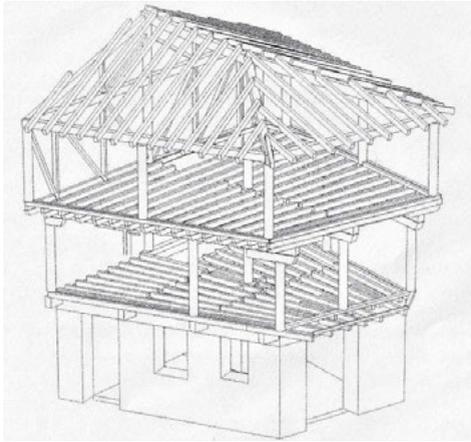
House structure in Garganta la Olla. (Source: Bujalance, 2019)
